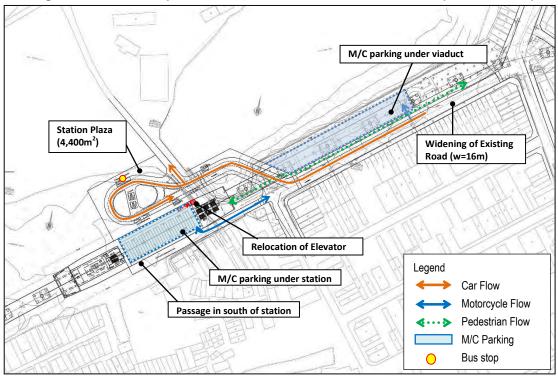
Concept Plan of the Van Thanh Park Station Area (Phase I and II)
